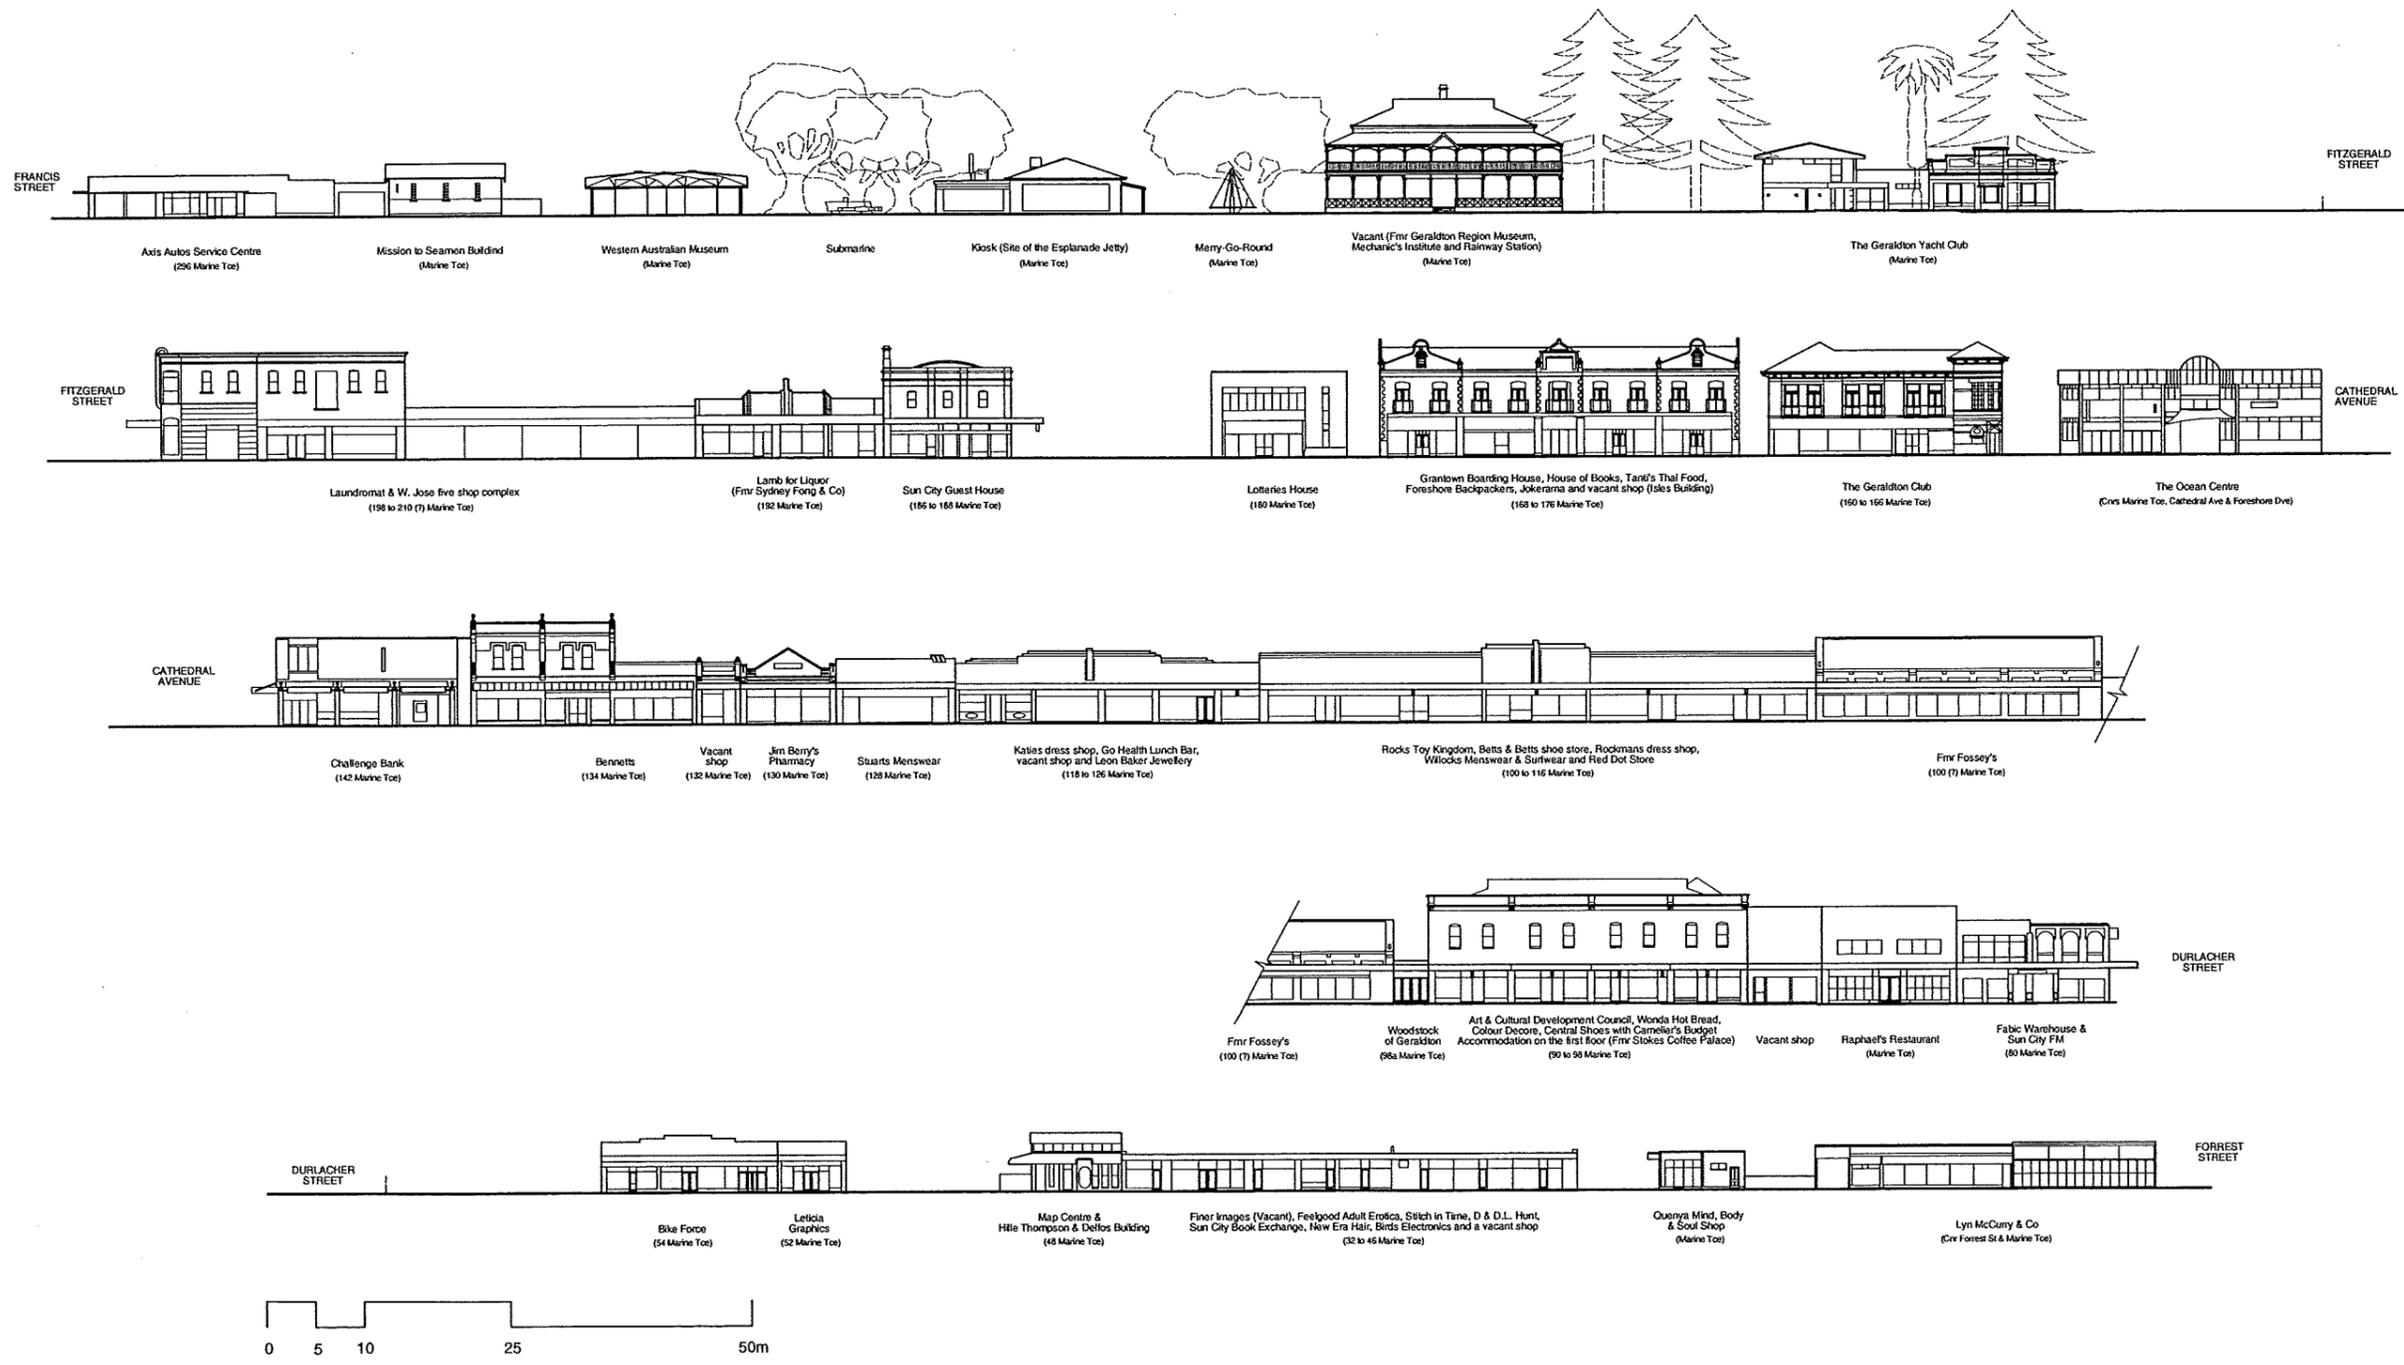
Marine Terrace Street Elevation looking north-west. Considine and Griffiths Architects. August 2002.
